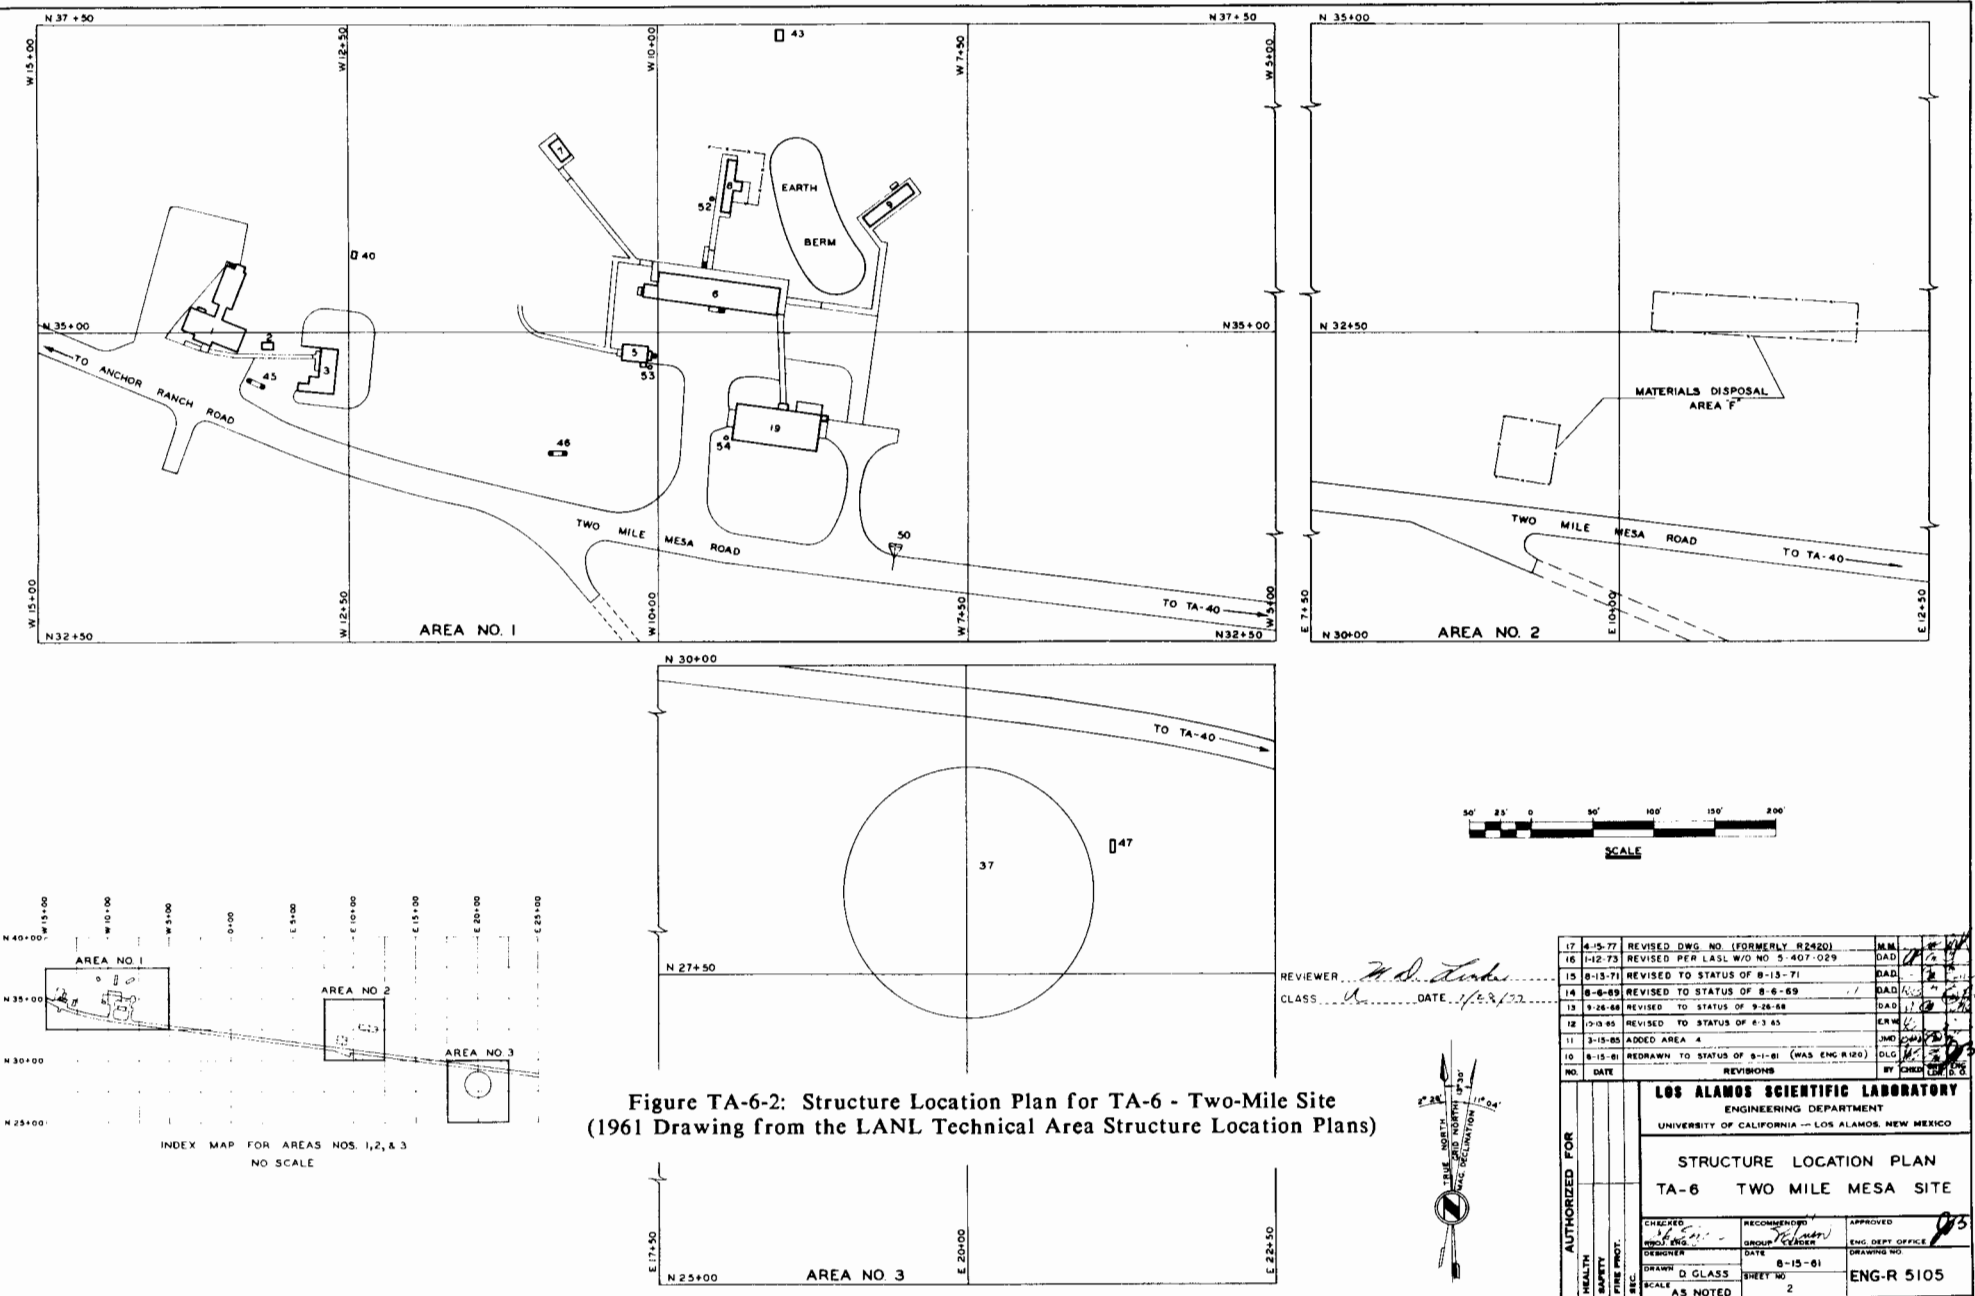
Structure Location Plan for TA-6 - Two-Mile Site (1961 Drawing from the LANL Technical Area Structure Location Plans)
